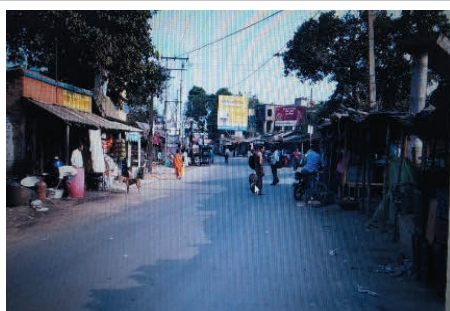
Congestion point at Nasigram Maldanga intersection of Monteswar Dainhat Road (Burdwan North Highway Division) due to encroachment of Road Shoulders (11.02.2021)
